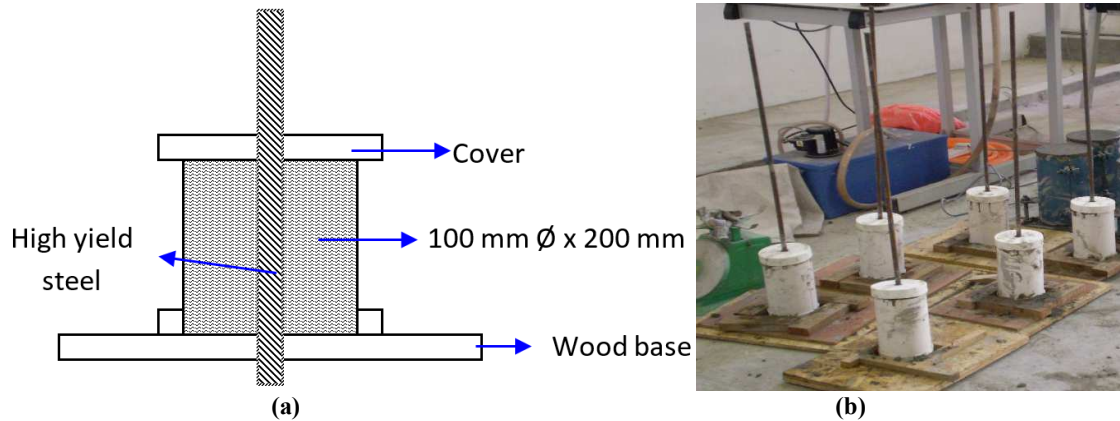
(a) Cross section of the specimen (b) the specimens stored in the storage room prior to demoulded for interfacial bond strength test
